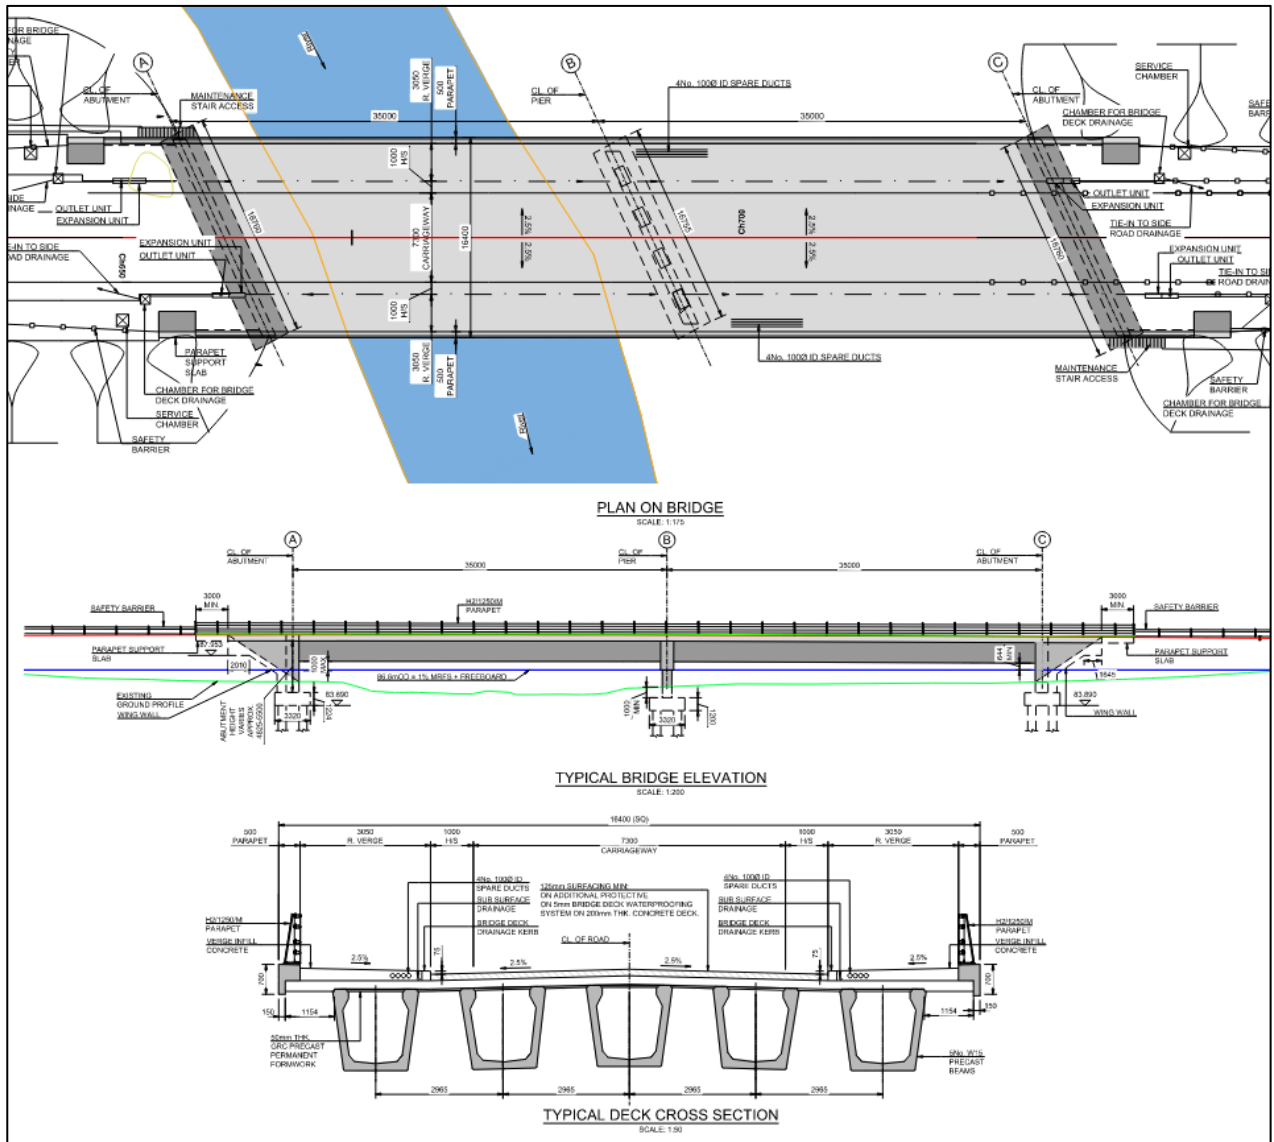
Plan, Elevation and Section of the Proposed Bridge crossing.
